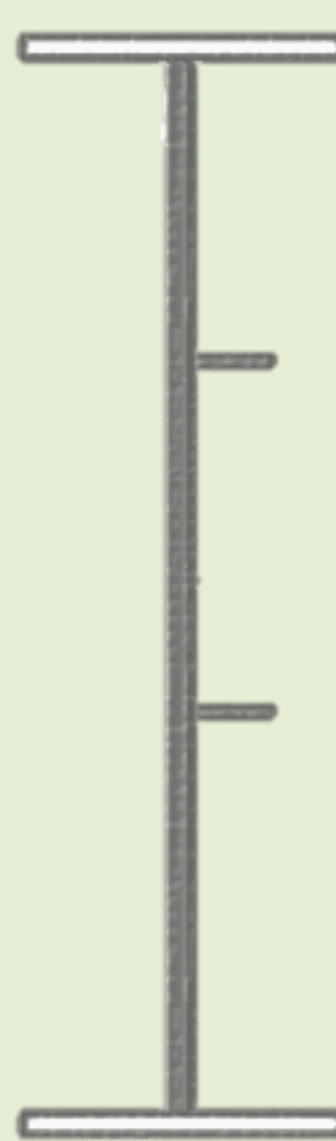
Girder with two weak open-section longitudinal stiffeners
